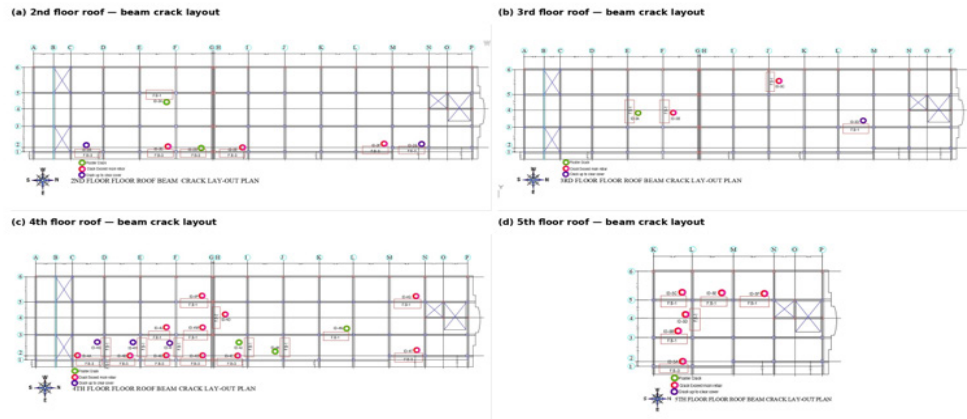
Beam crack layout plans for the four surveyed roof levels, showing grid lines and individual crack IDs colour-coded by severity: (a) 2nd floor, (b) 3rd floor, (c) 4th floor, (d) 5th floor.
